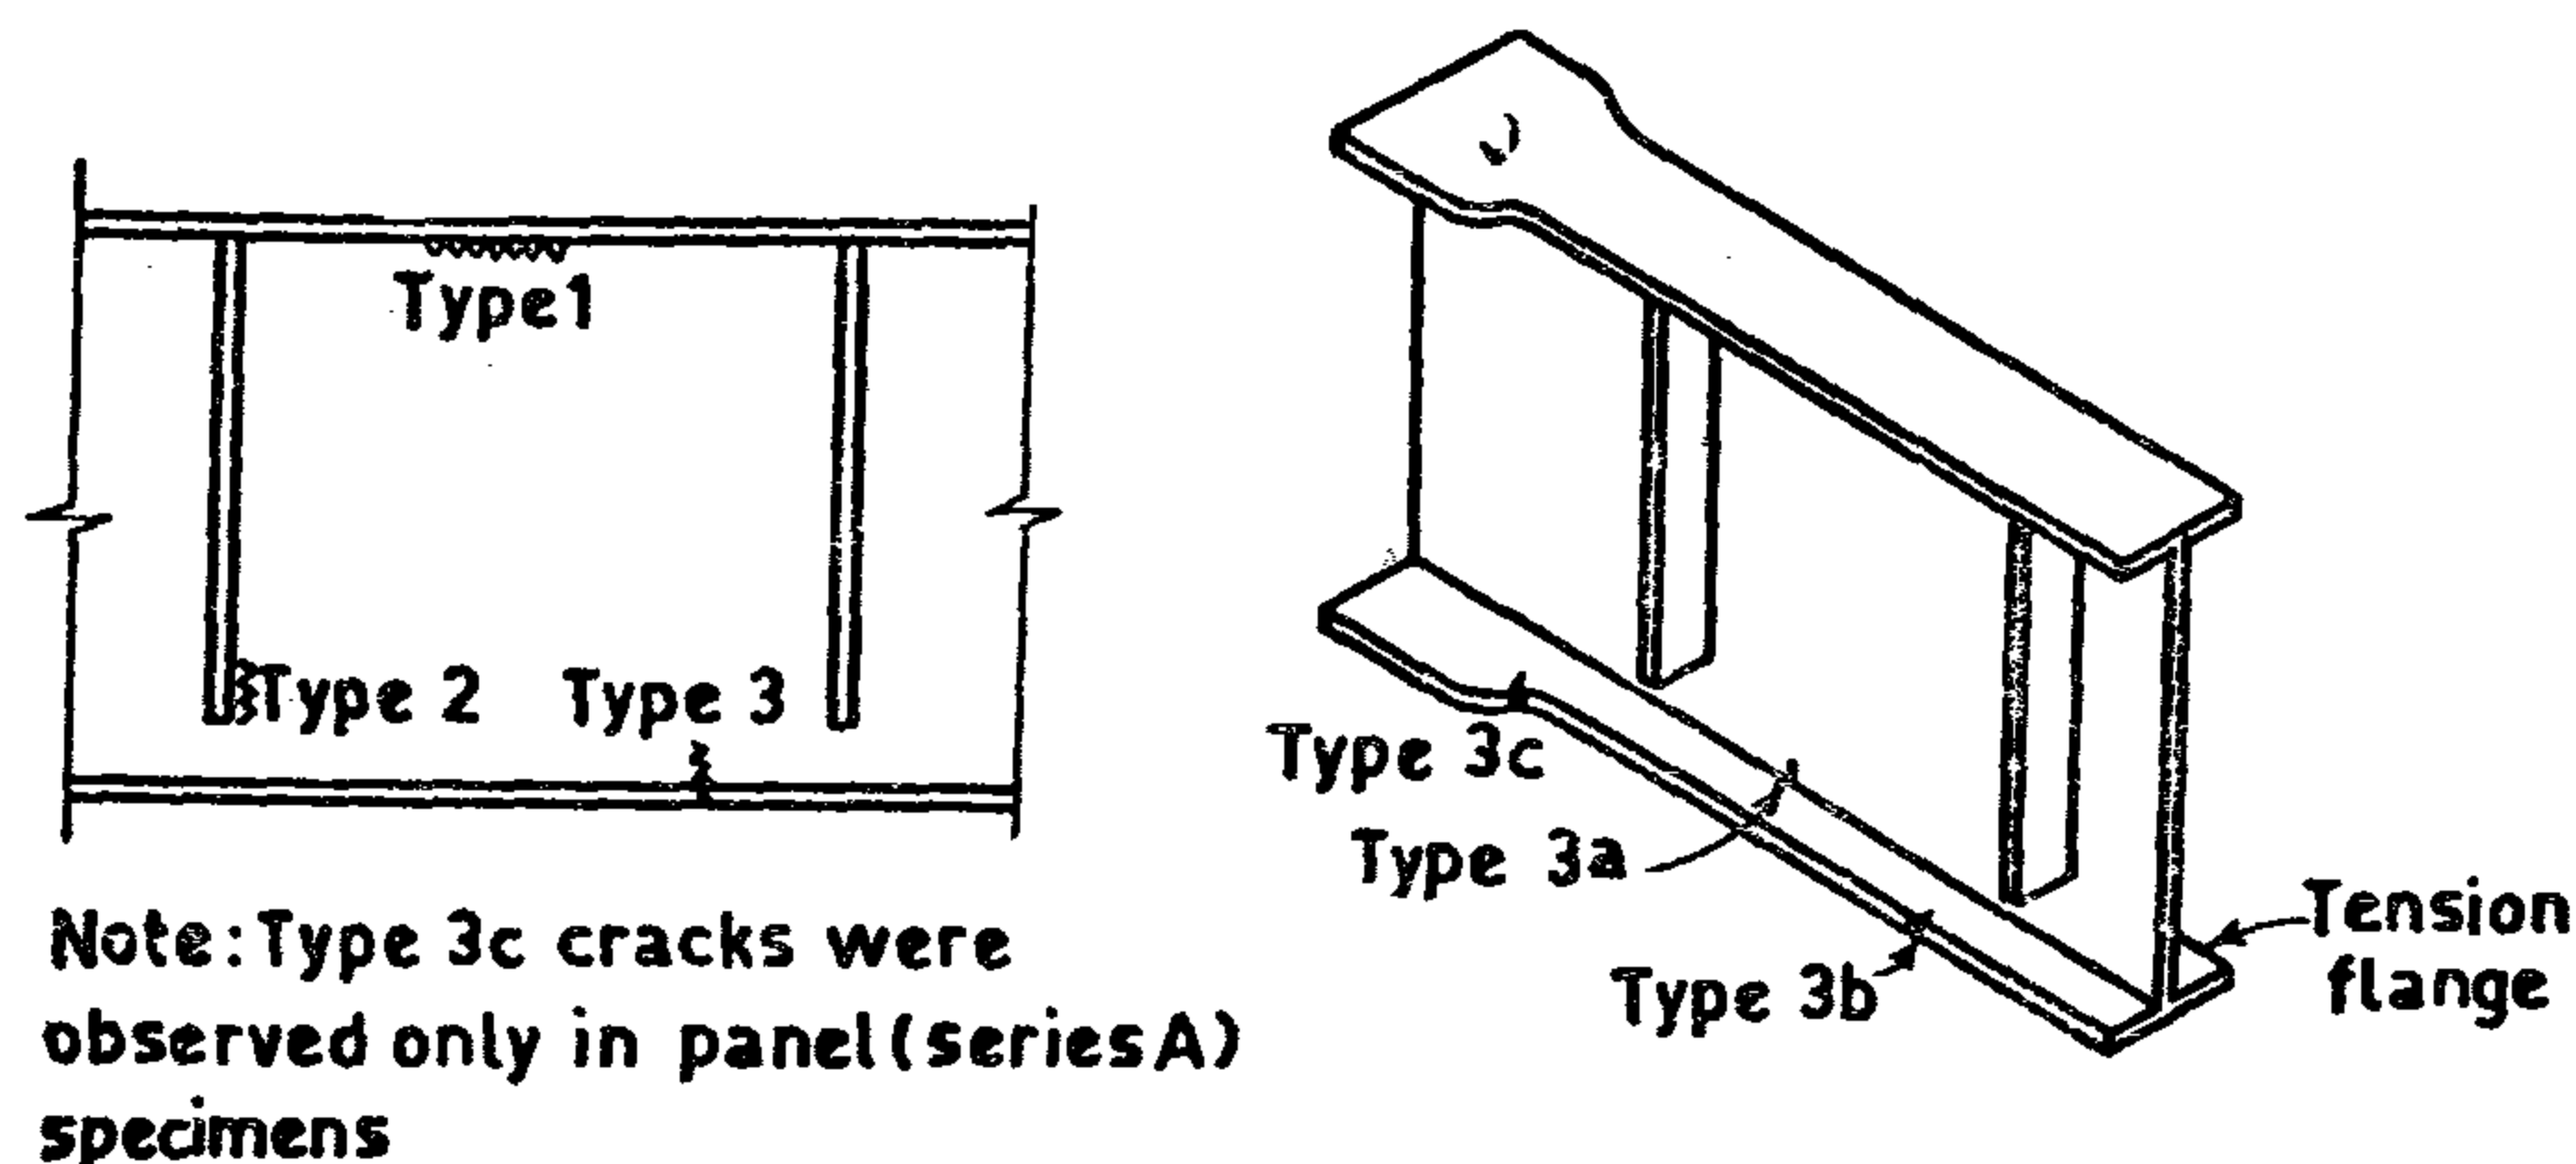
Fatigue cracks in hybrid bending specimens.
